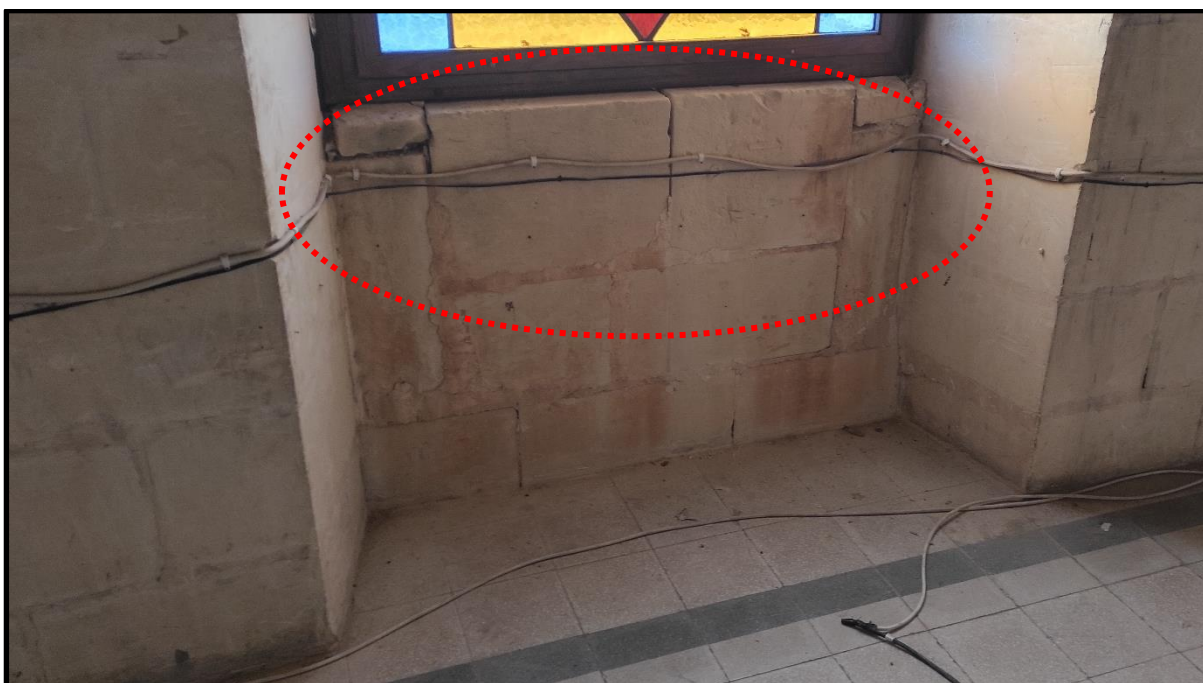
Chapel – Balcony wall (front facade) – Open joints and dislocated masonry blocks
